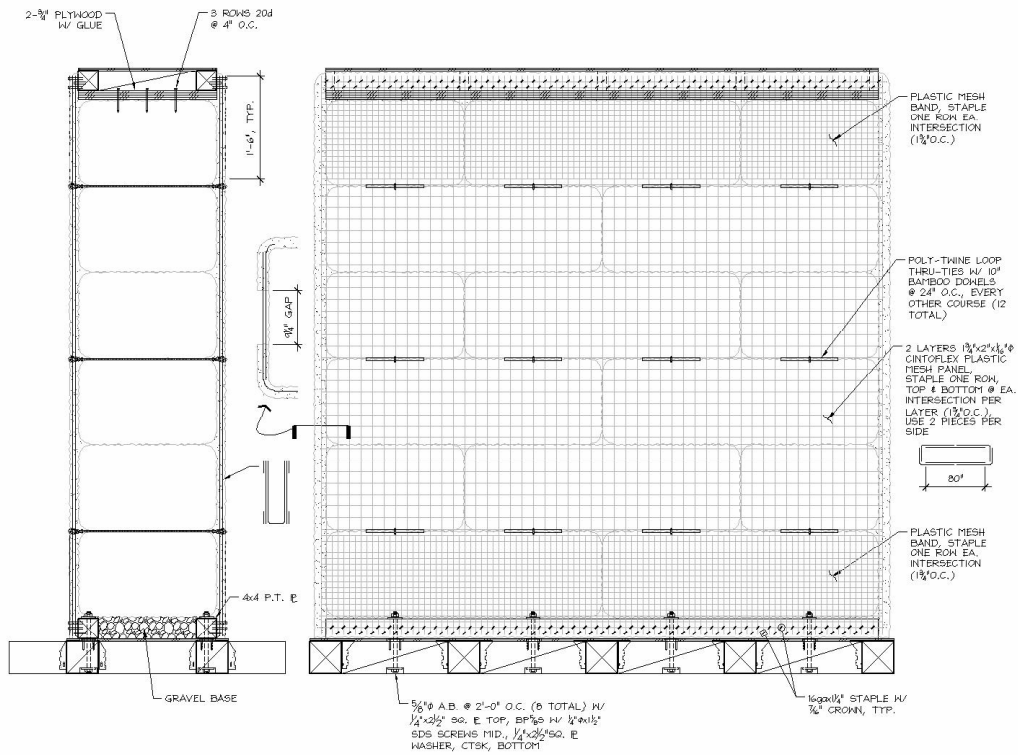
Details of Wall B—Earth plaster with intermediate detailing
